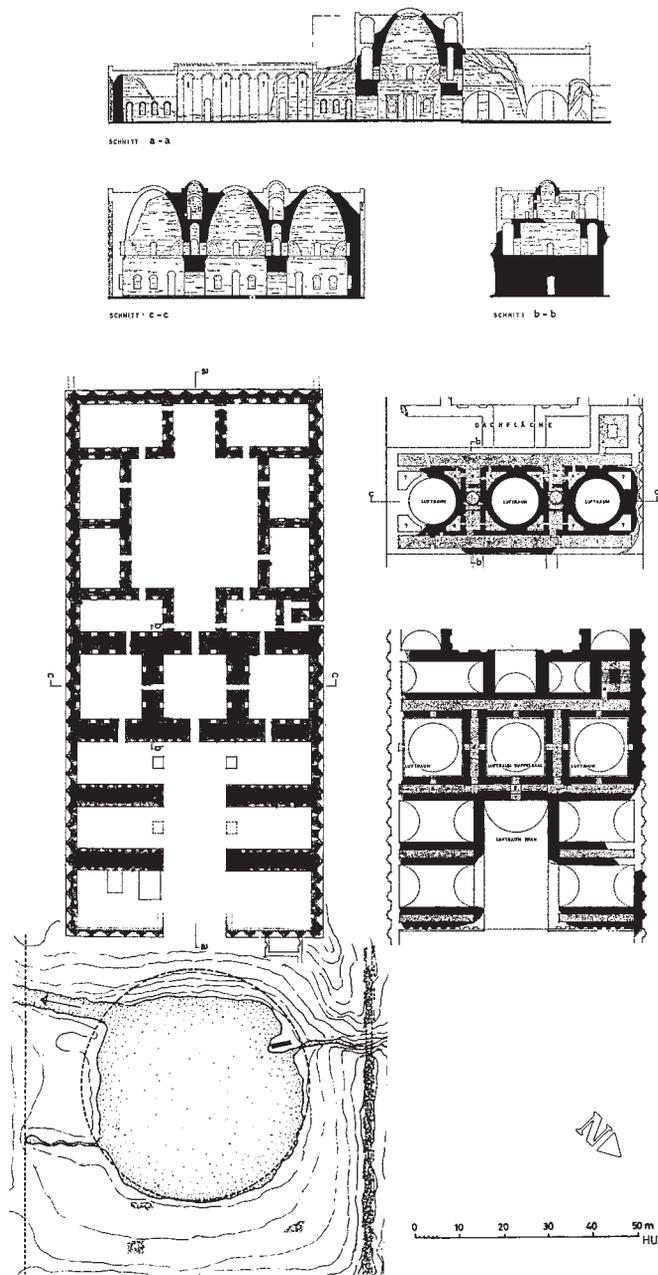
Firuzabad. Atash-Kadeh. Later palace of Ardashir I. Plans of ground floor, first and second upper stories.
